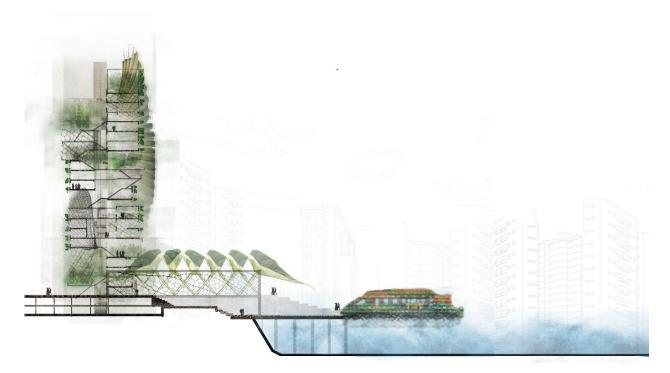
Student Work: Building/Site Section Source: (Samantha Jesser, University of Idaho)
